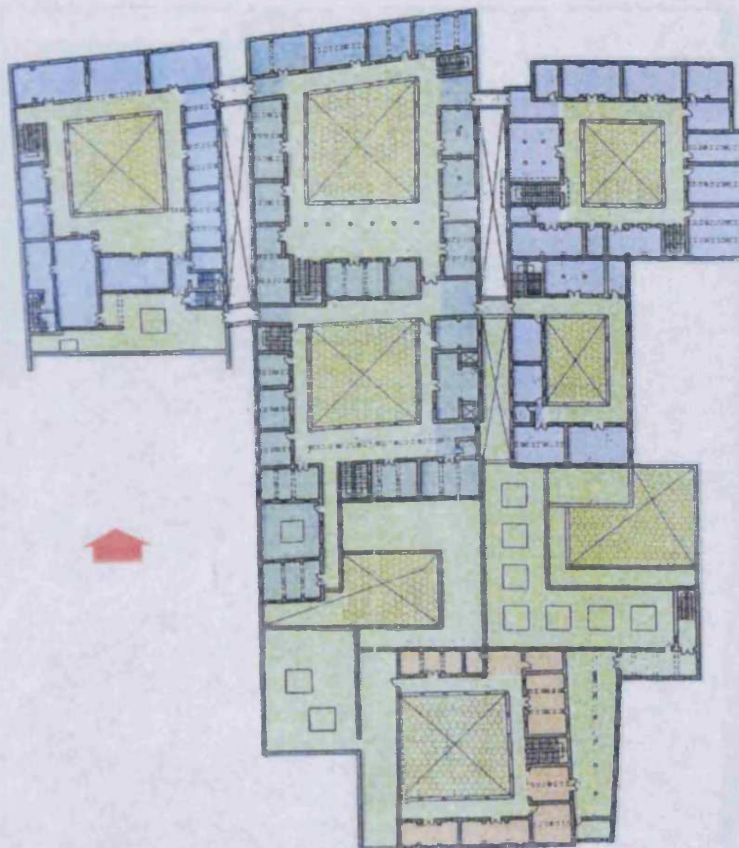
First floor of the mud buildings. Source: ADR modified by the author ⁽⁶⁻³⁾.
